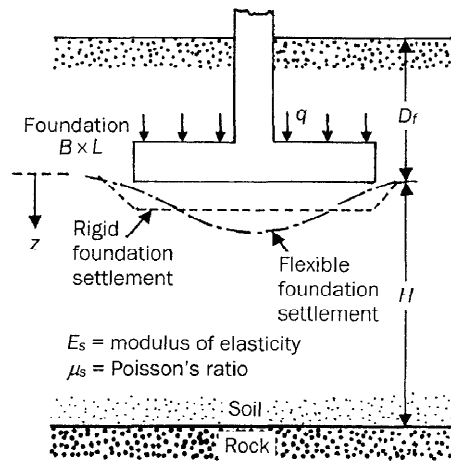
Settlement profile for shallow flexible and rigid foundation.
